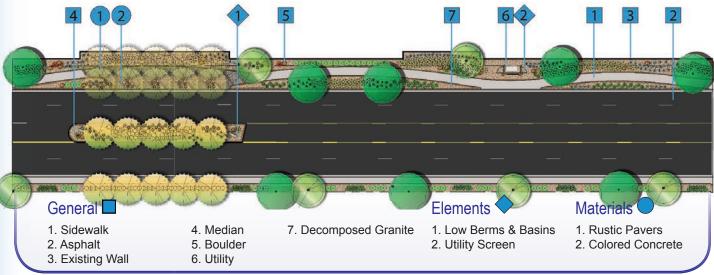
Representative "Good" Resort Living Streetscape Plan
